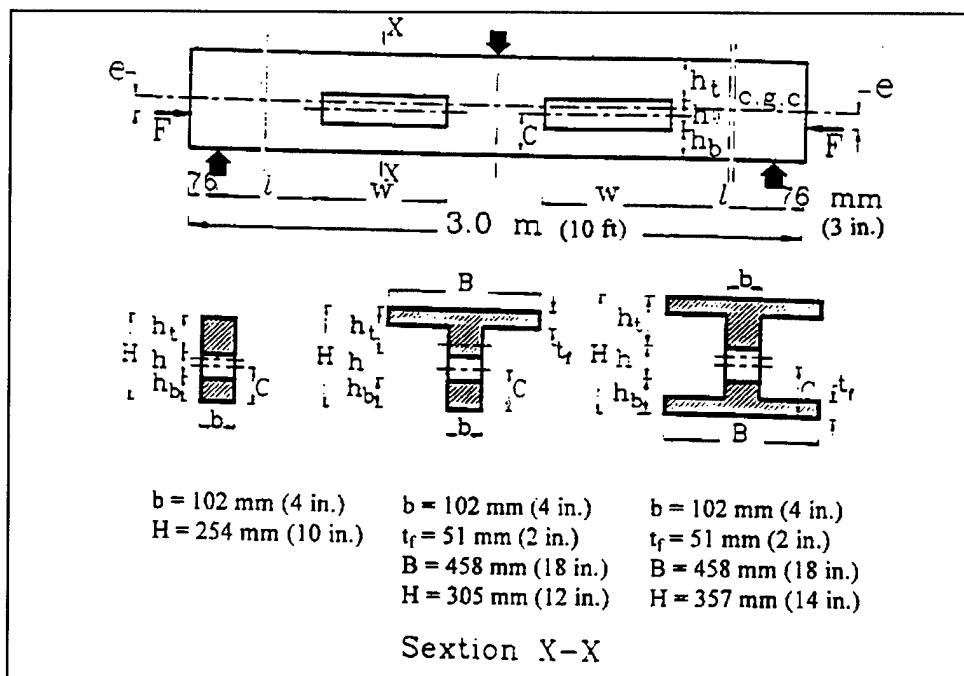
Layout of test beams as adapted from Abdella (1993).
